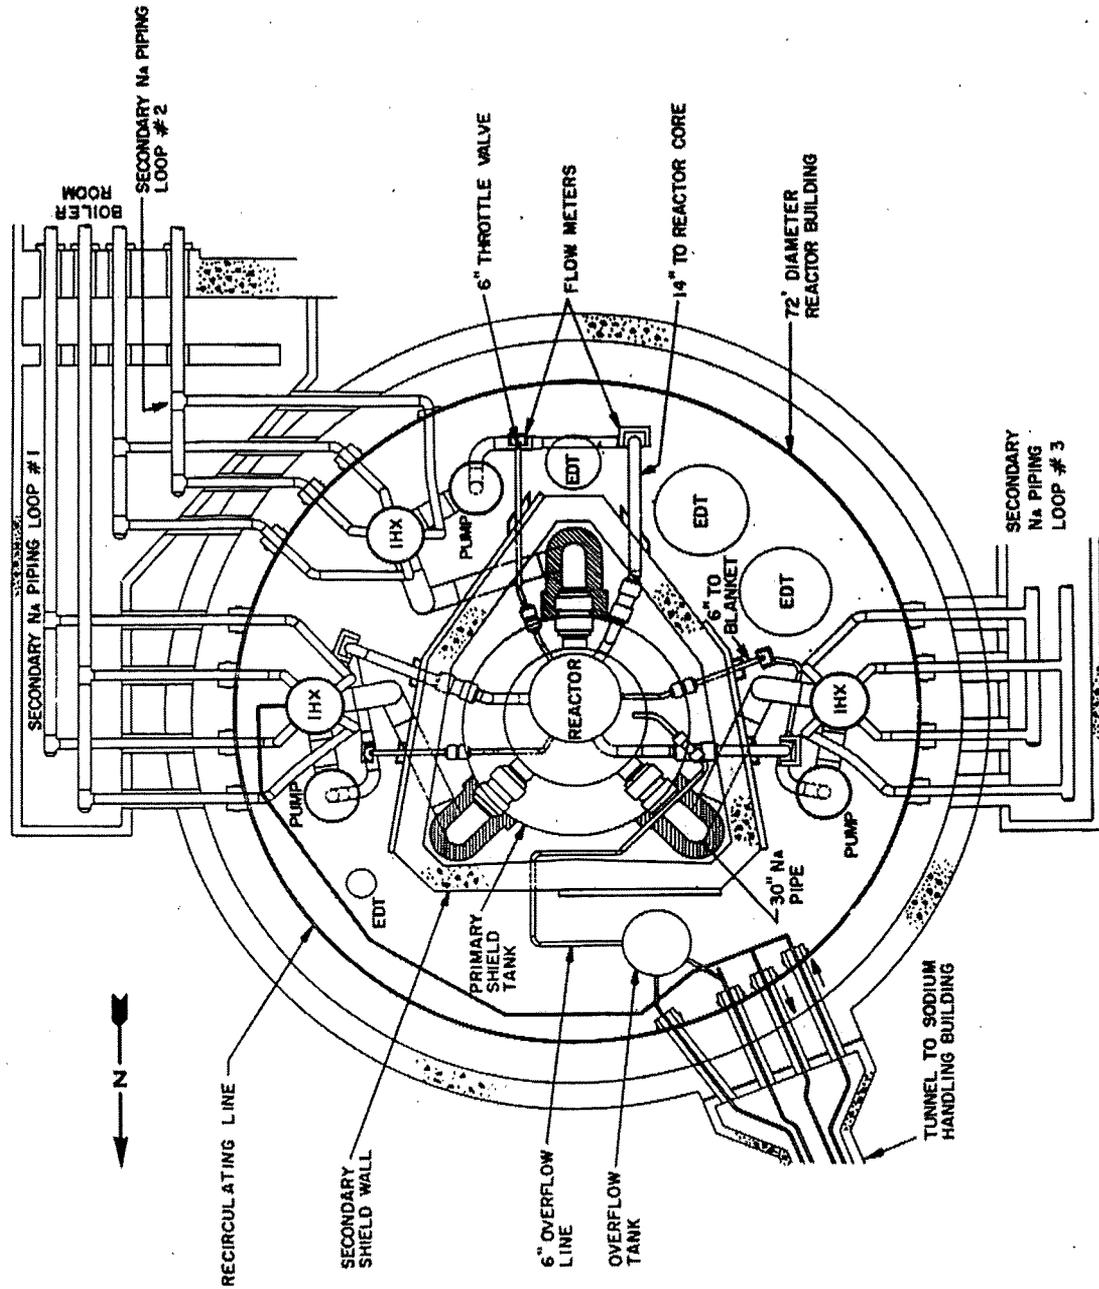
Plan View of Reactor Plant Below Operating Floor
